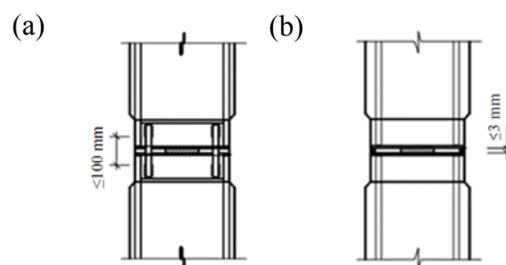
Column-column connection with steel shoes: (a) with circular strengthening plates; (b) without plates.
